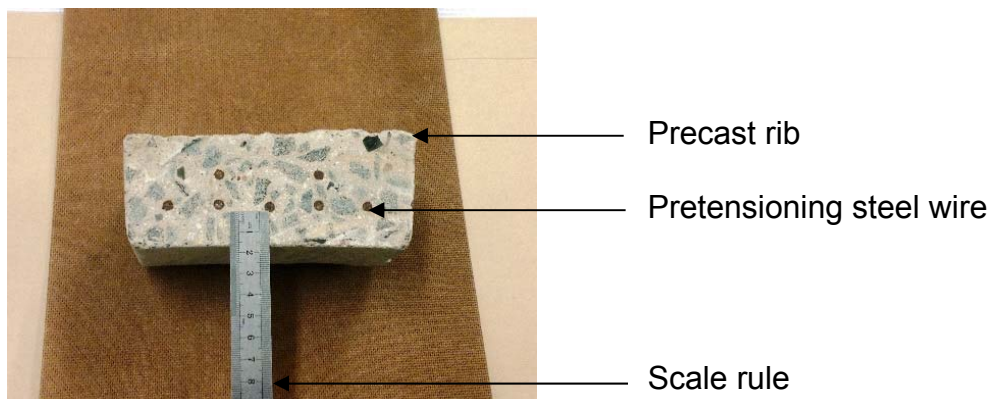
Typical precast rib showing a concrete cover over the wires
